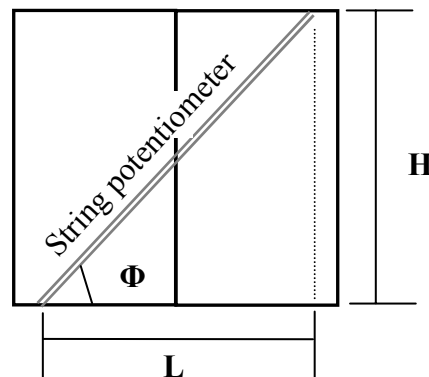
Typical configuration of a string potentiometer installed across a shear wall
